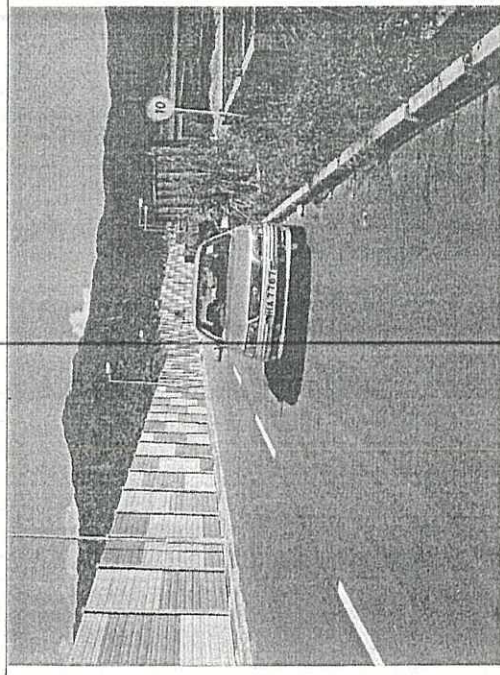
Noise Barriers along the Eastern Perimeter Road
